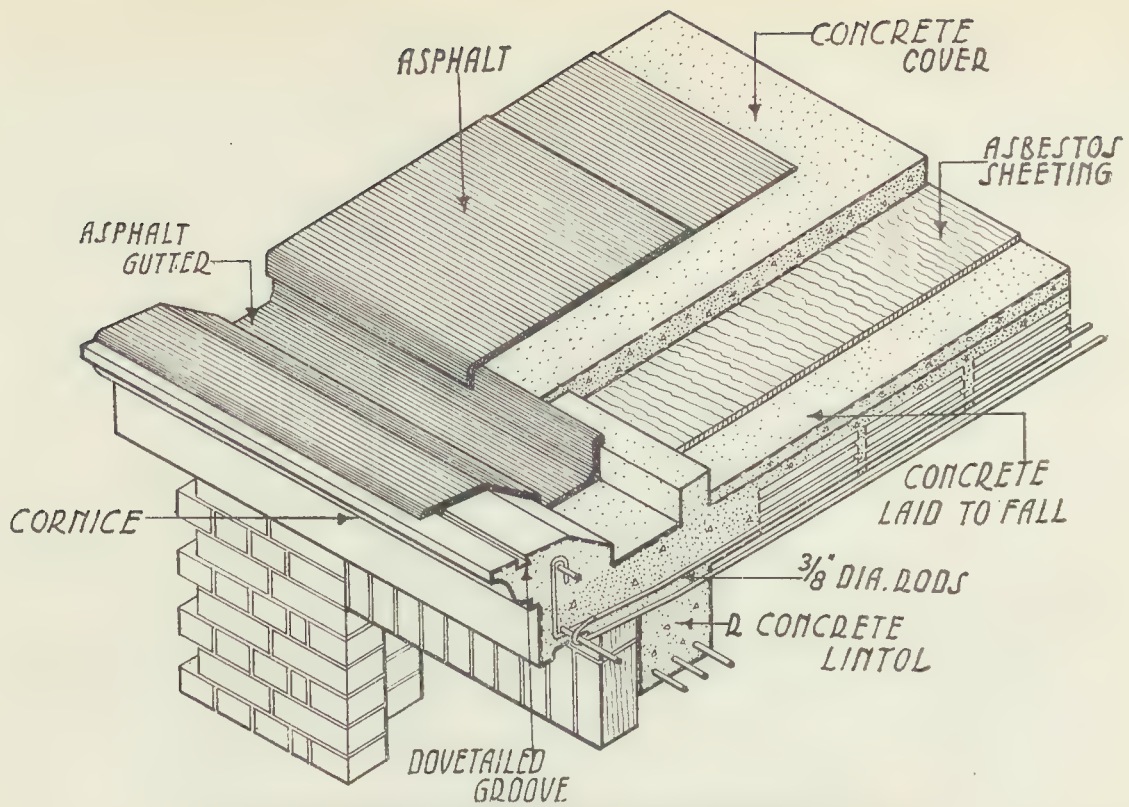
REINFORCED CONCRETE CORNICE AND FINISH TO FLAT ROOF
